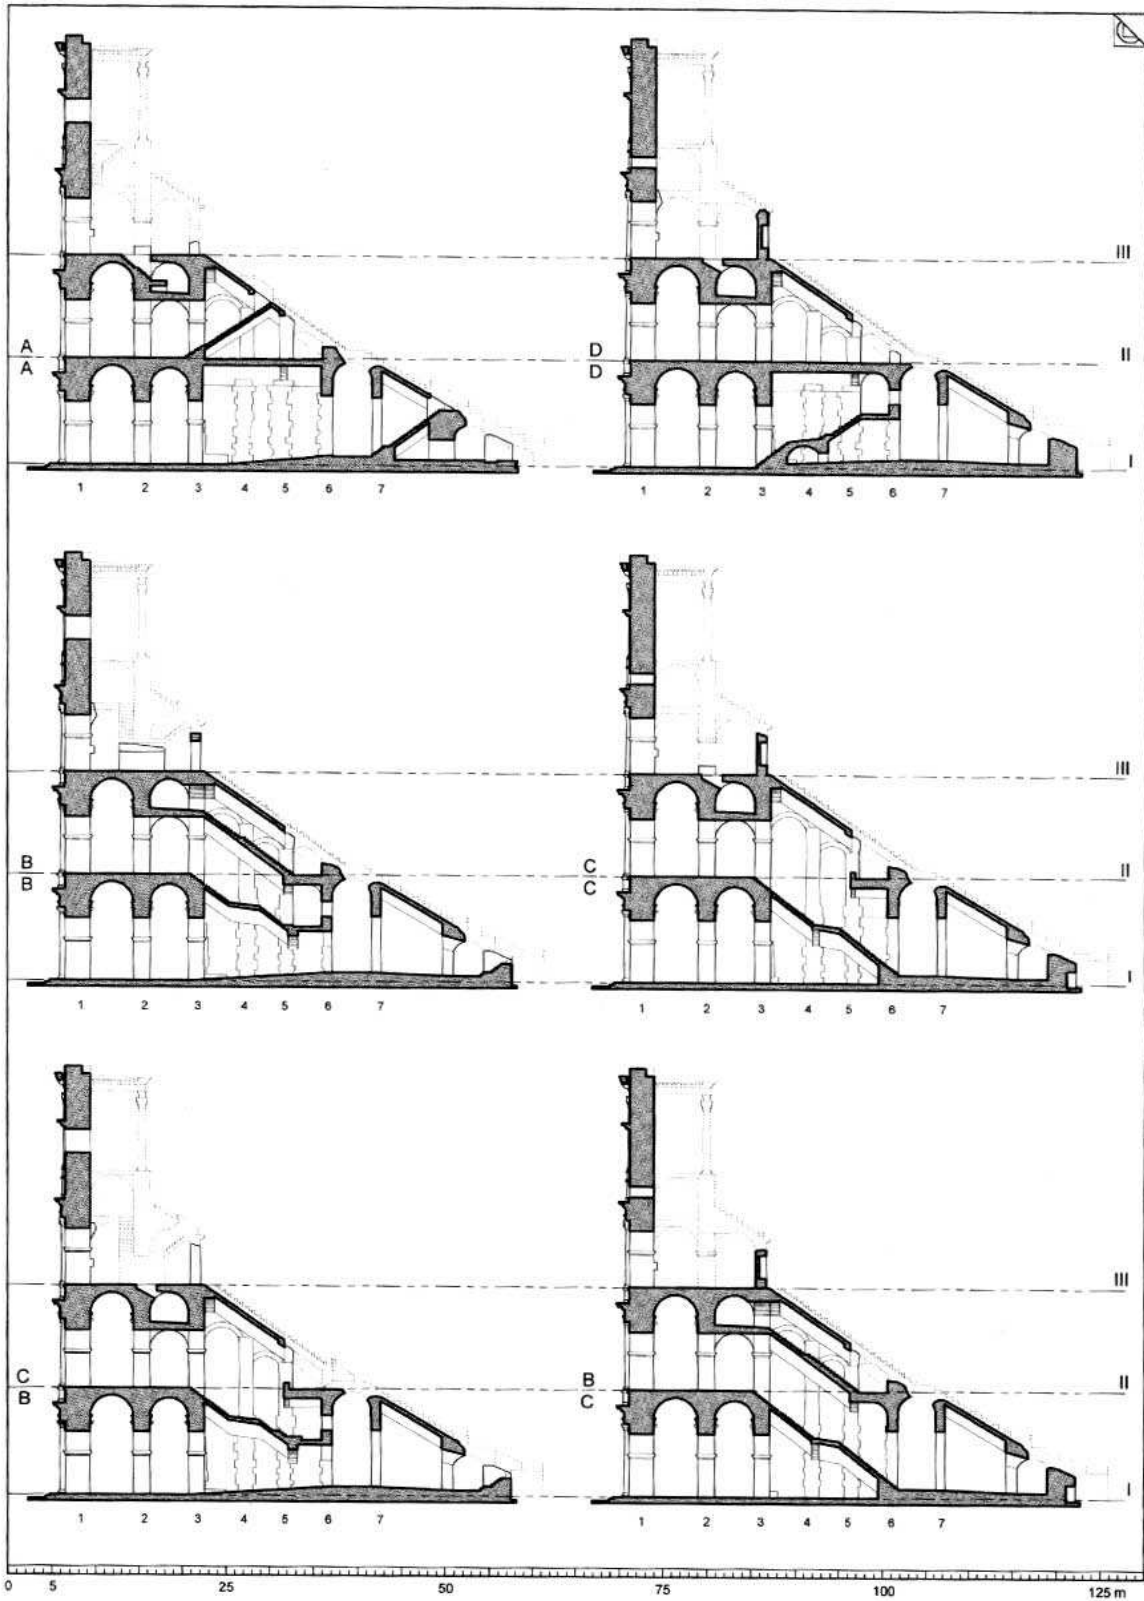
Scheme of sections showing the six possible configurations (made up of type A, B, C, and D stairs) for the outer stair ring at the Colosseum, scale 1: 800
